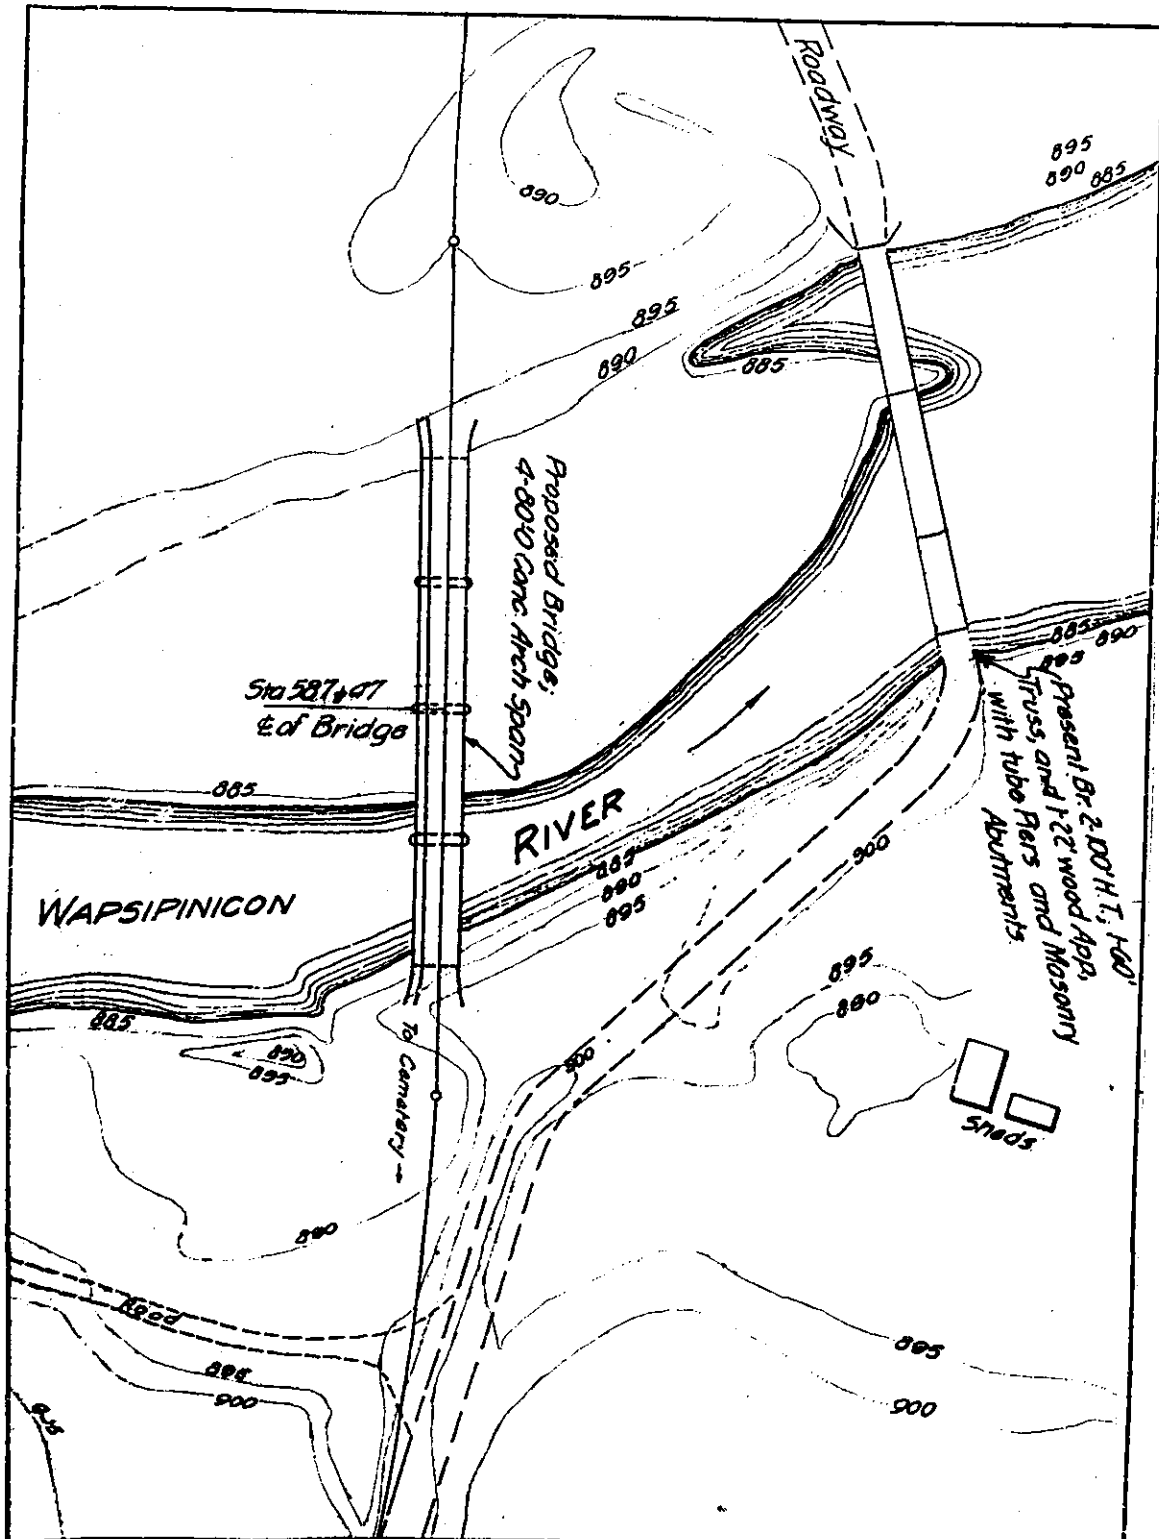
"Situation Plan" from bridge plans: Design for Multiple Span Concrete Arch Bridge. June 1926.
